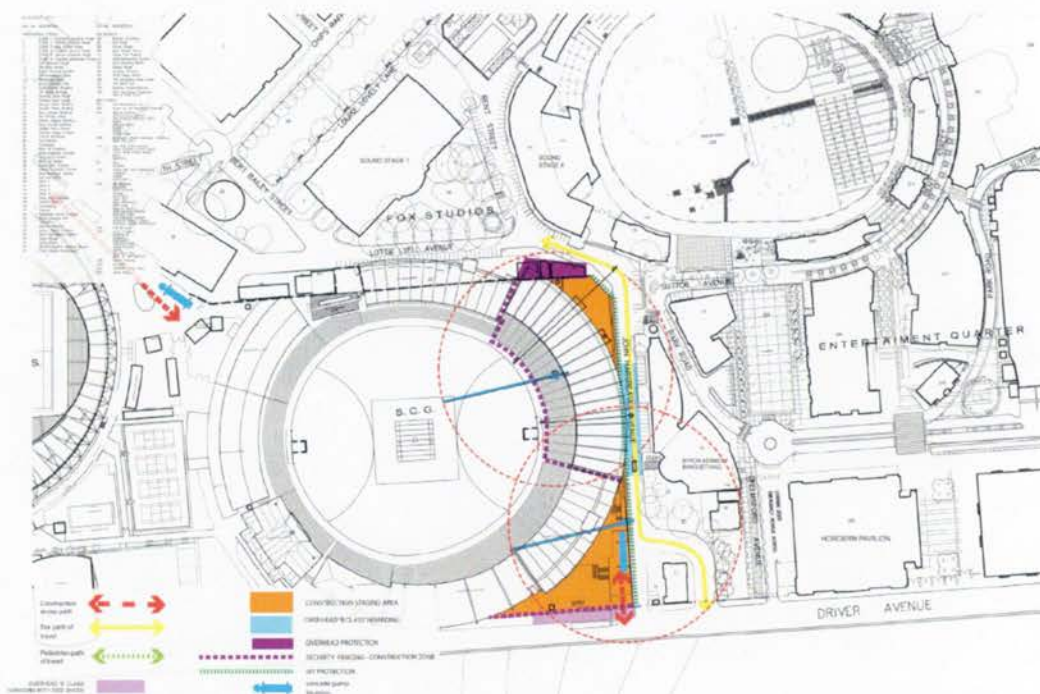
Main Contract Works Construction (Source BBC Consulting Planners)
